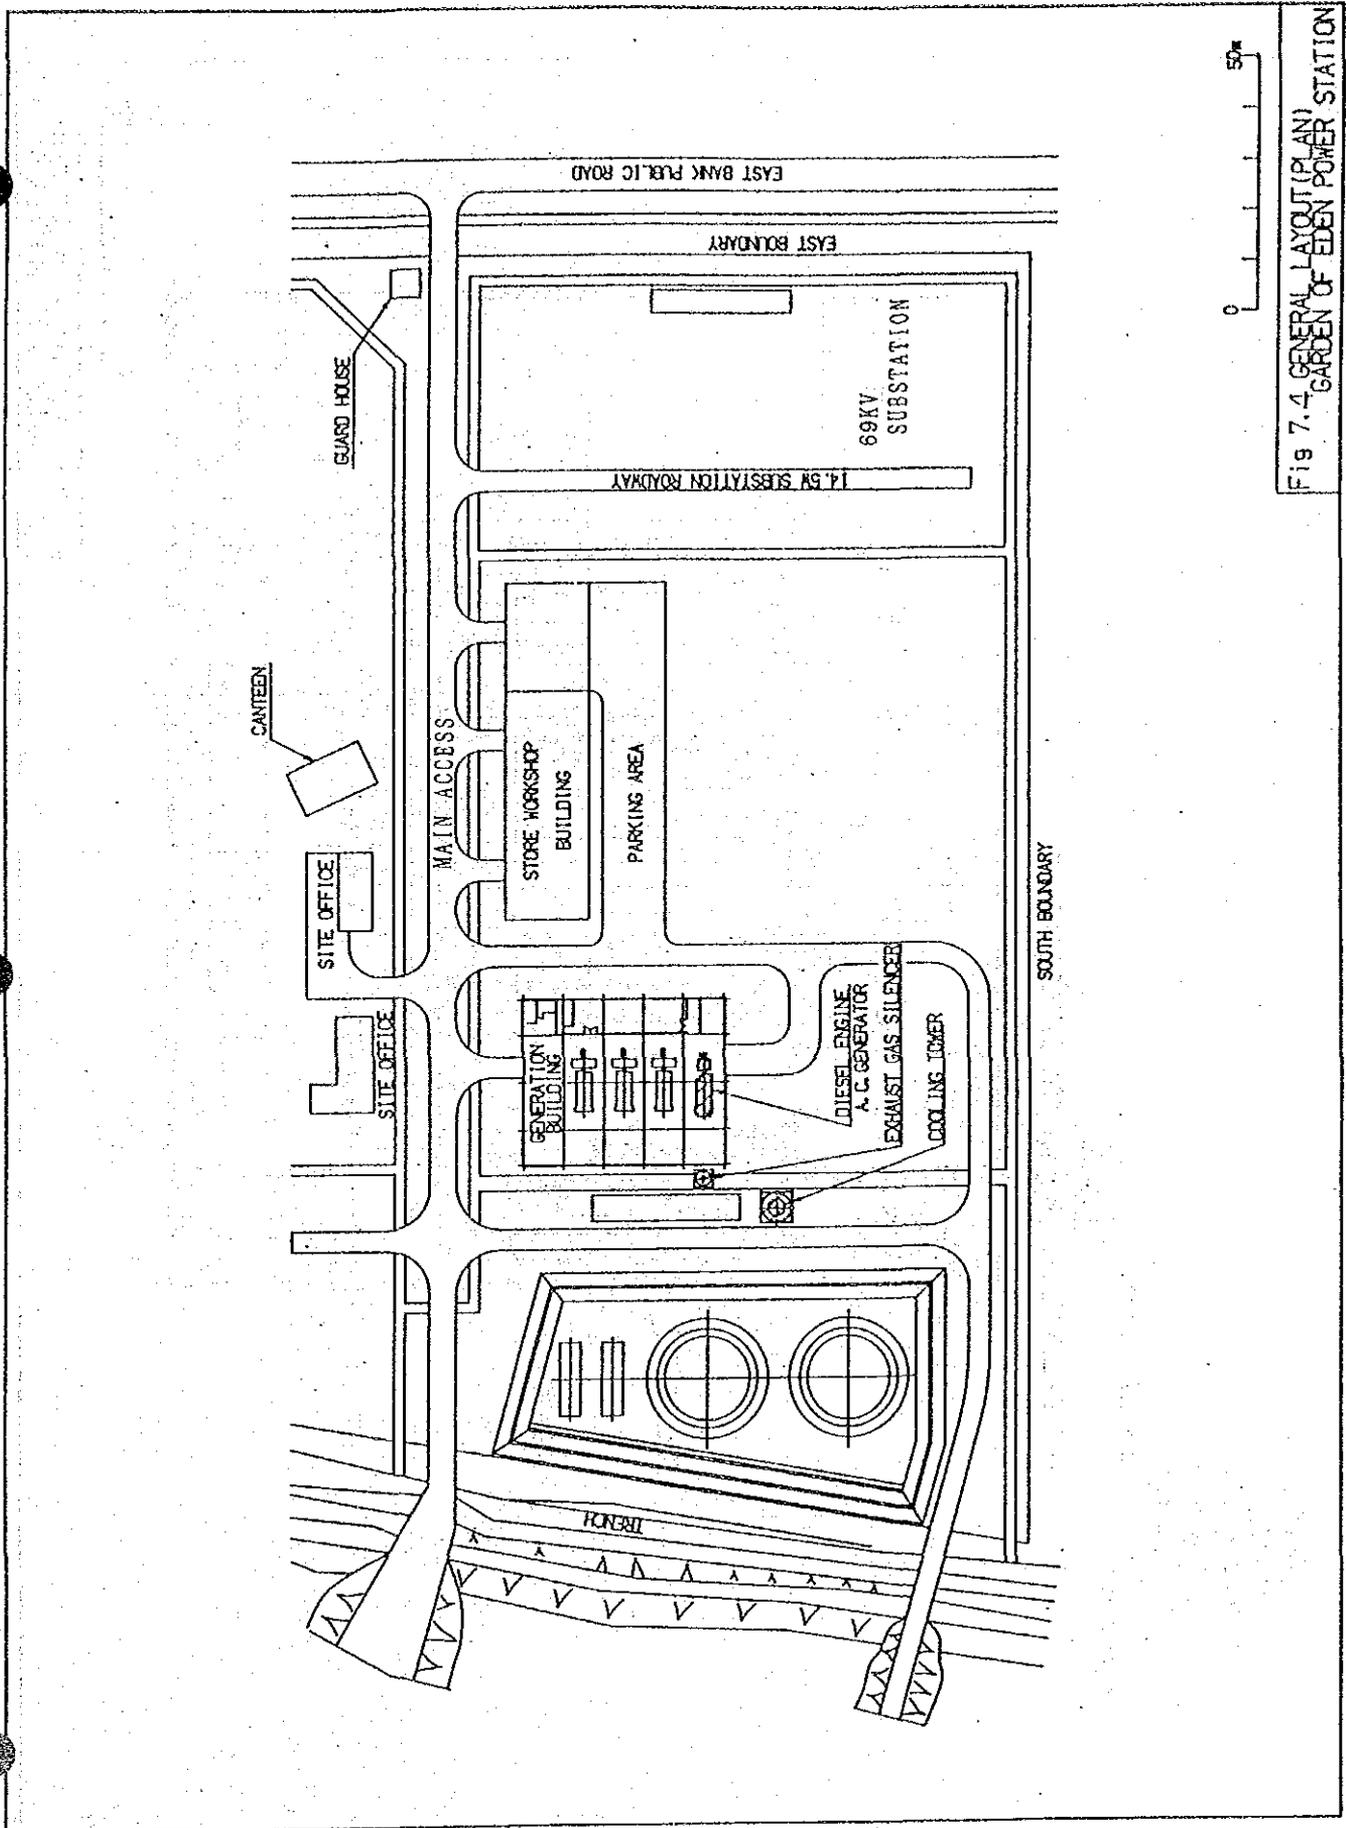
GENERAL LAYOUT (PLAN) GARDEN OF EDEN POWER STATION
